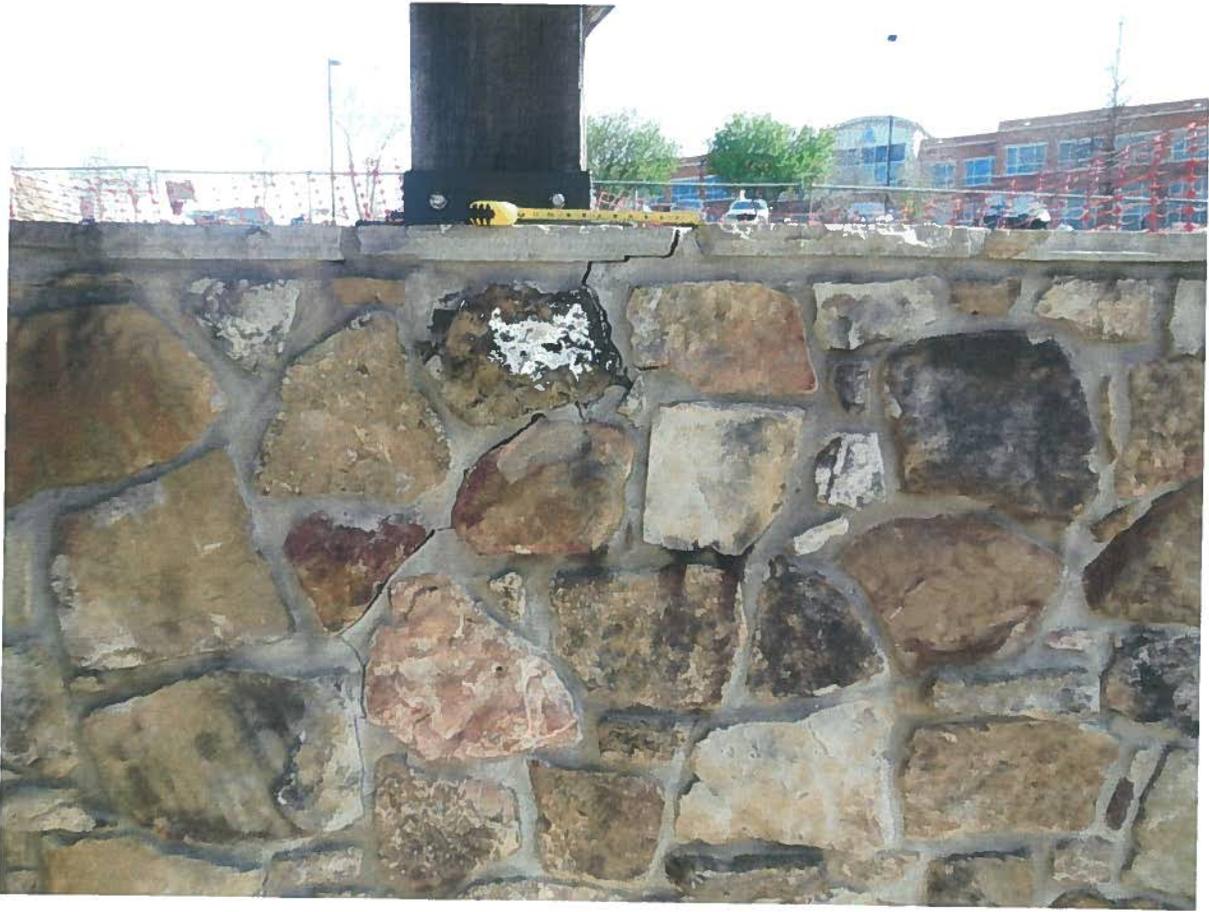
Meandering Crack in Stone/Masonry Wall below Column 6
